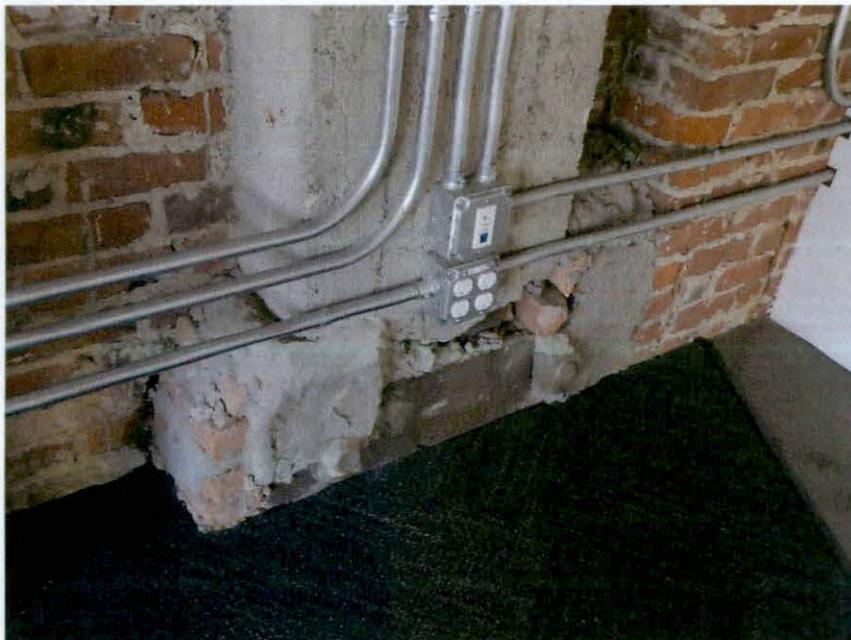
Photo Y: Detail of brick masonry at concrete walls at 3rd level with exposed steel members and deteriorated mortar joints.
